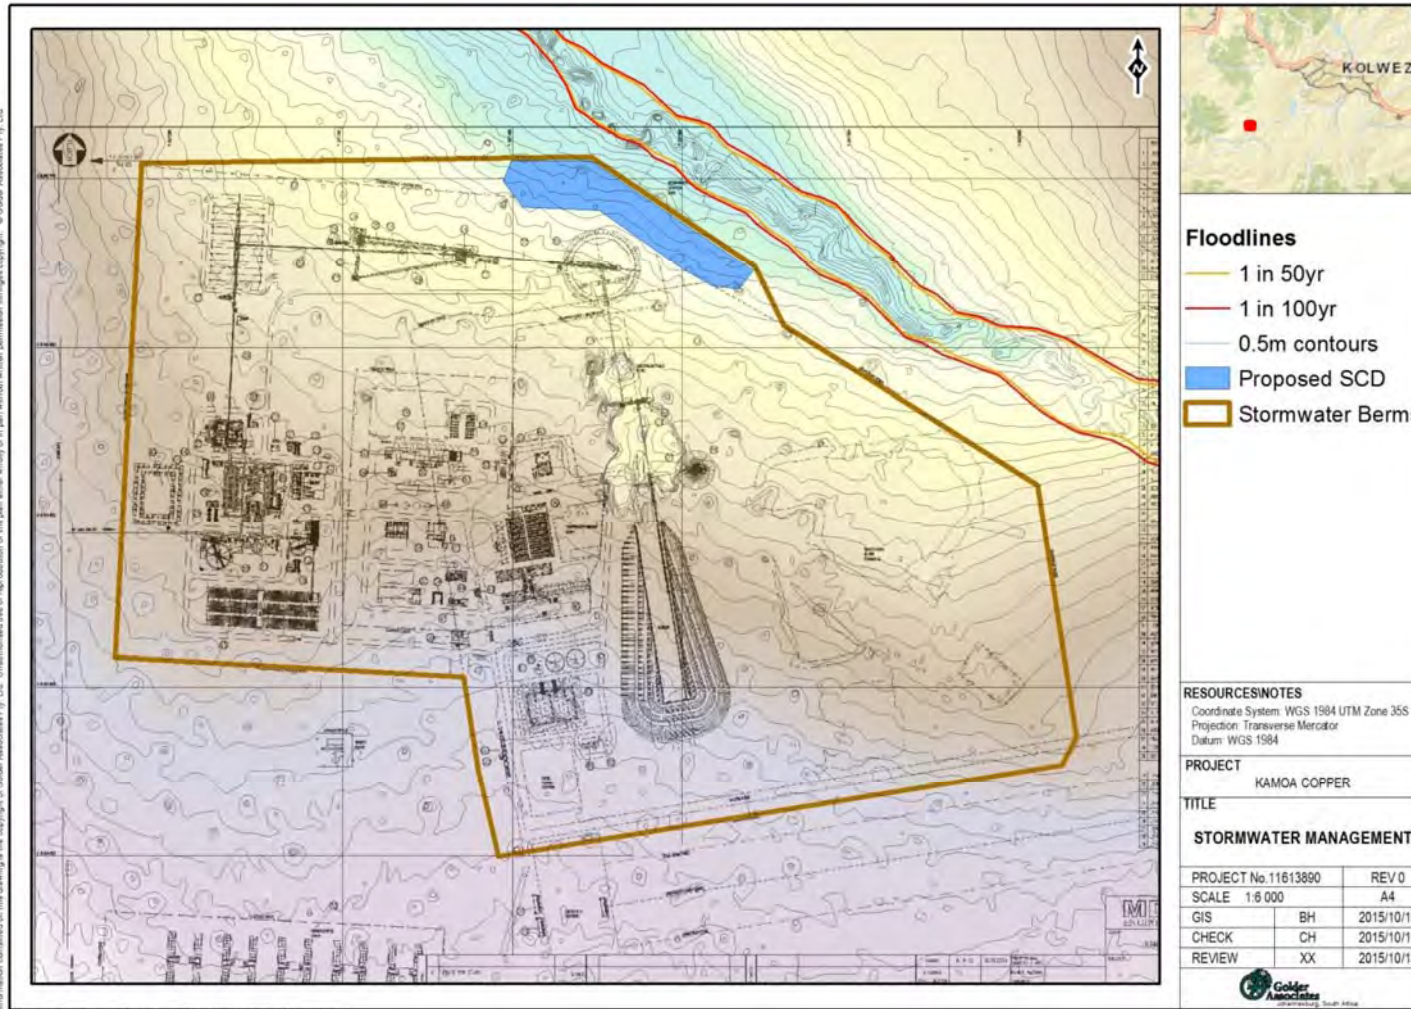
Polluted runoff area delineation and recommended placement of stormwater dam and berms (Kansoko Mine)
